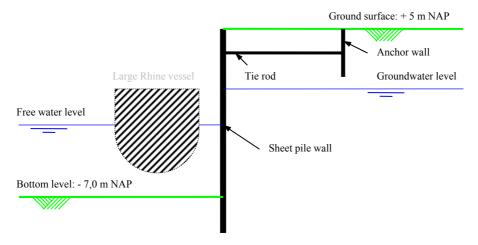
Case 1, sheet pile wall with tie rod and anchor wall
